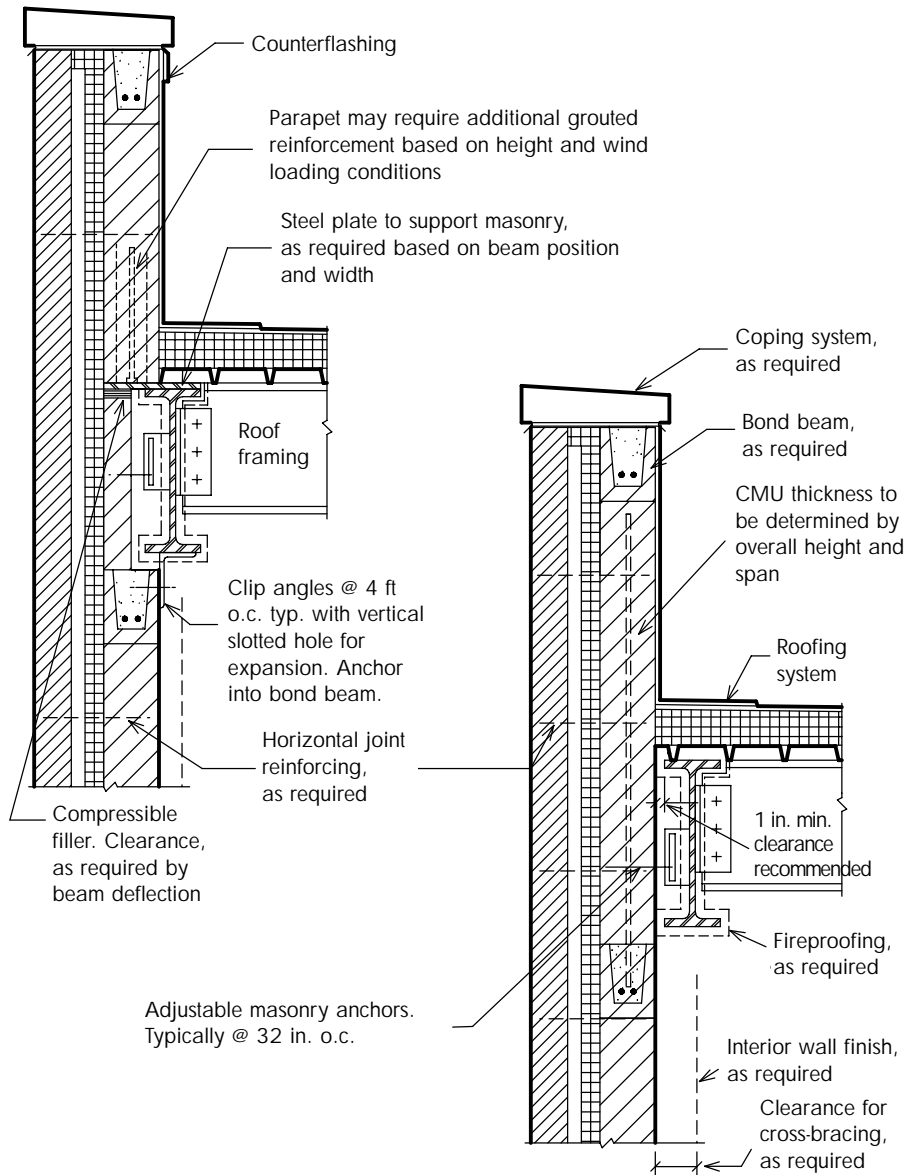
Detailing Considerations for Masonry (Sample Wall Section Details at Roof)
